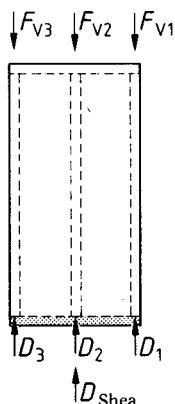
Panels comprising one sheathing board under vertical load, F_{Vi} , compressive force, D_i , in the lower horizontal timber and force D_{Shea} transmitted from sheathing to lower horizontal timber
